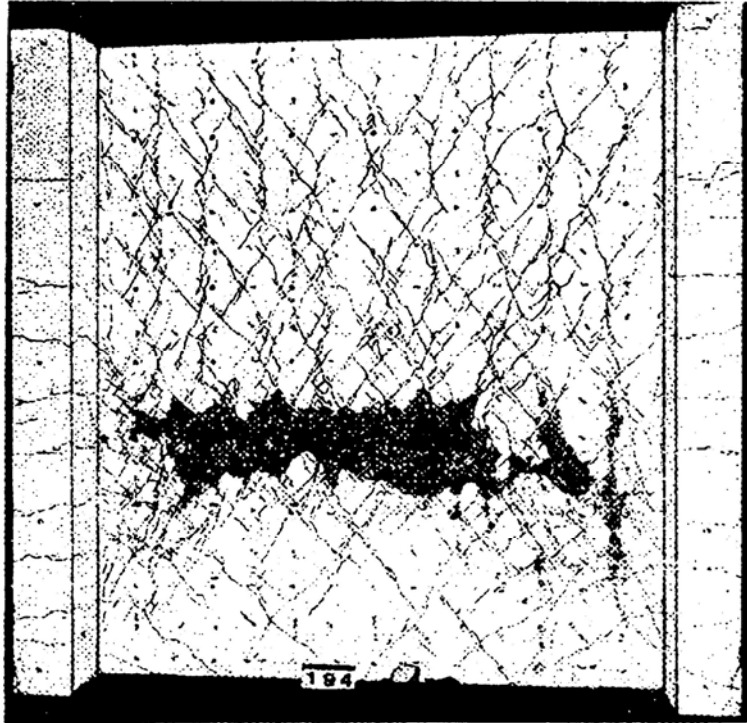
Cracking pattern for wall S7 tested by Maier and Thürlimann (1985) at crushing of diagonal compression struts
